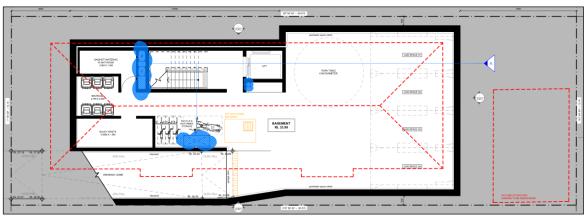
Proposed basement plan (source: Common Office, dated 29/05/2025)
